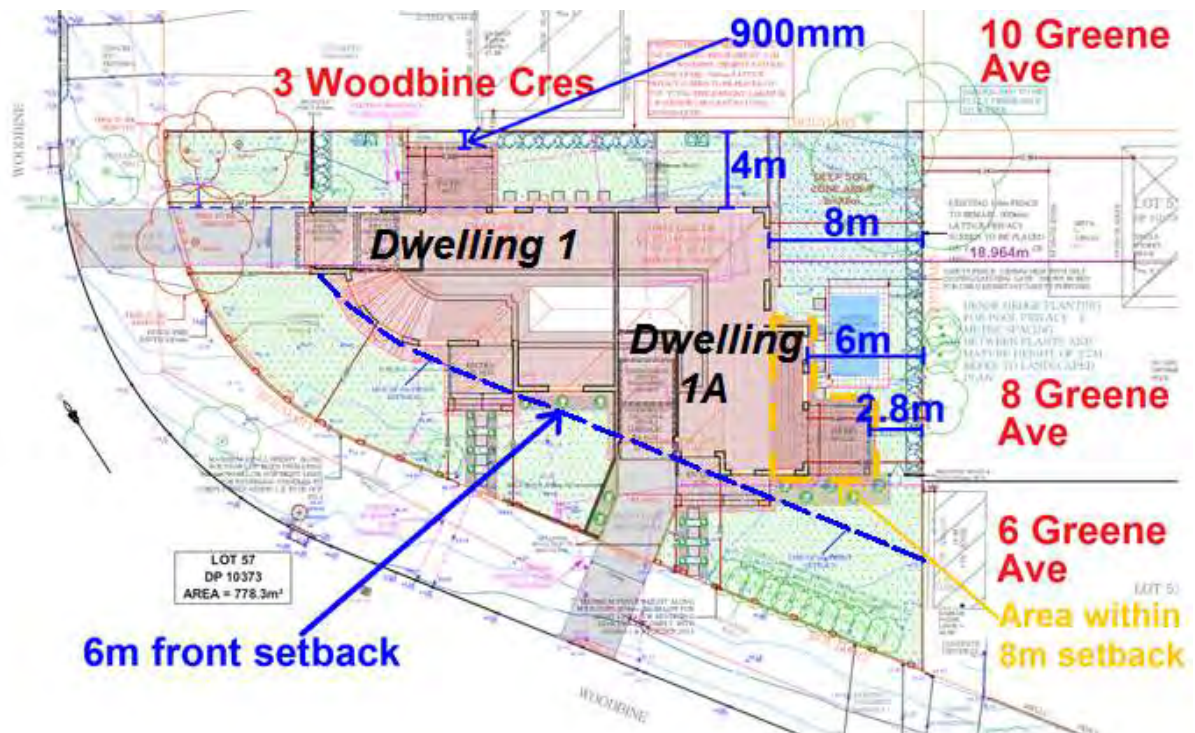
Site Plan outlining the portions of the proposed building within the 6m front setback area
